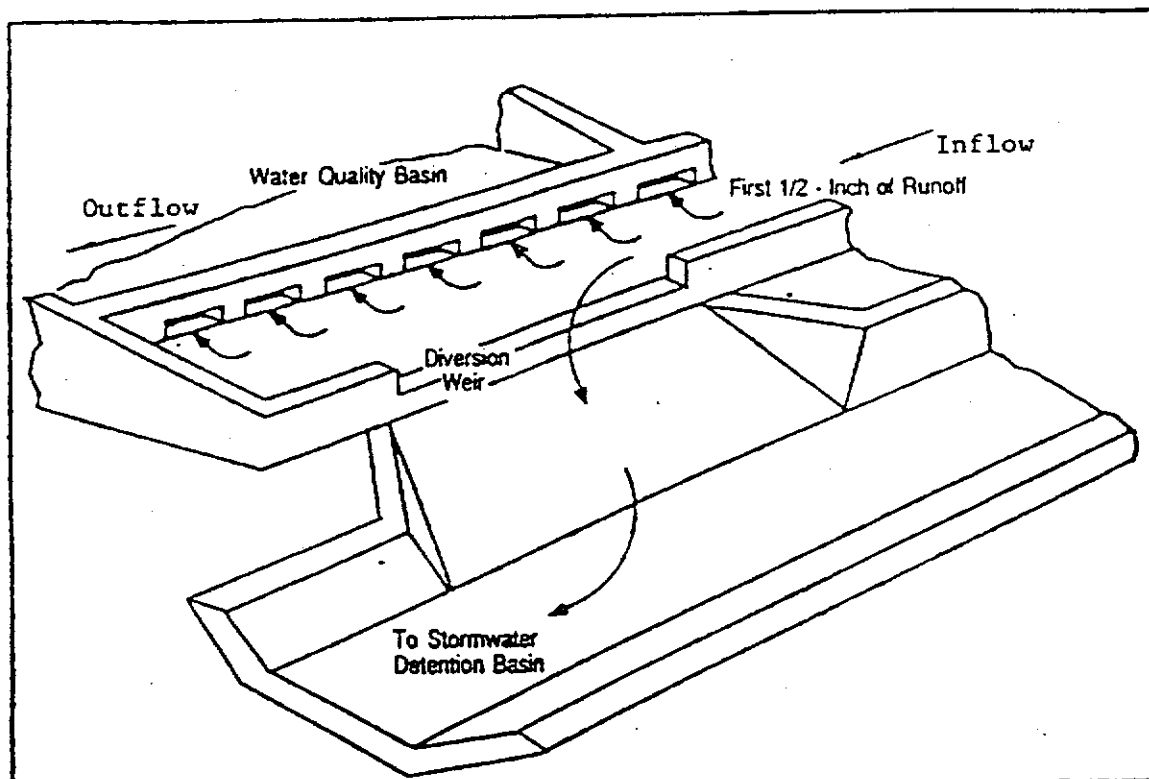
B. CONCEPTUAL PLAN OF JOLLYVILLE FILTRATION POND I —
